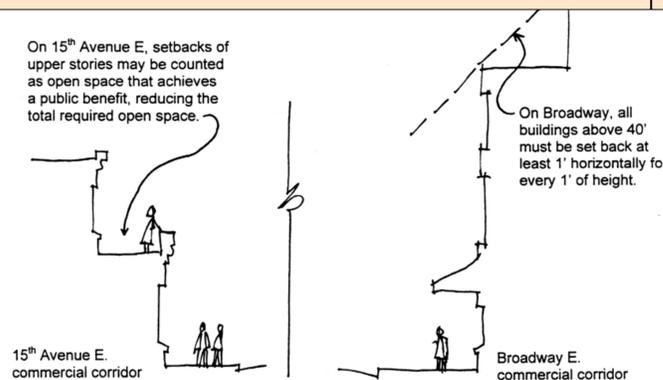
An upper story setback reduces the height of the street wall on 15th Avenue E.
